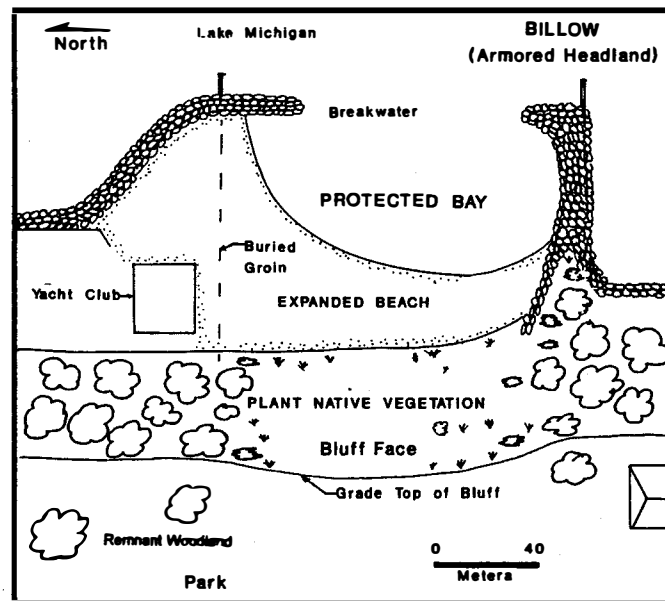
Plan view of Sunrise Park and Beach following project construction.
